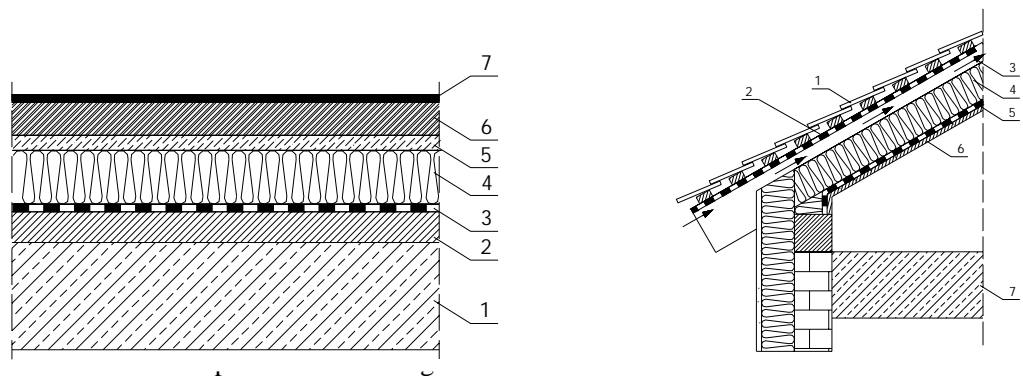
Two examples of common roof constructions (flat and pitched roof).
